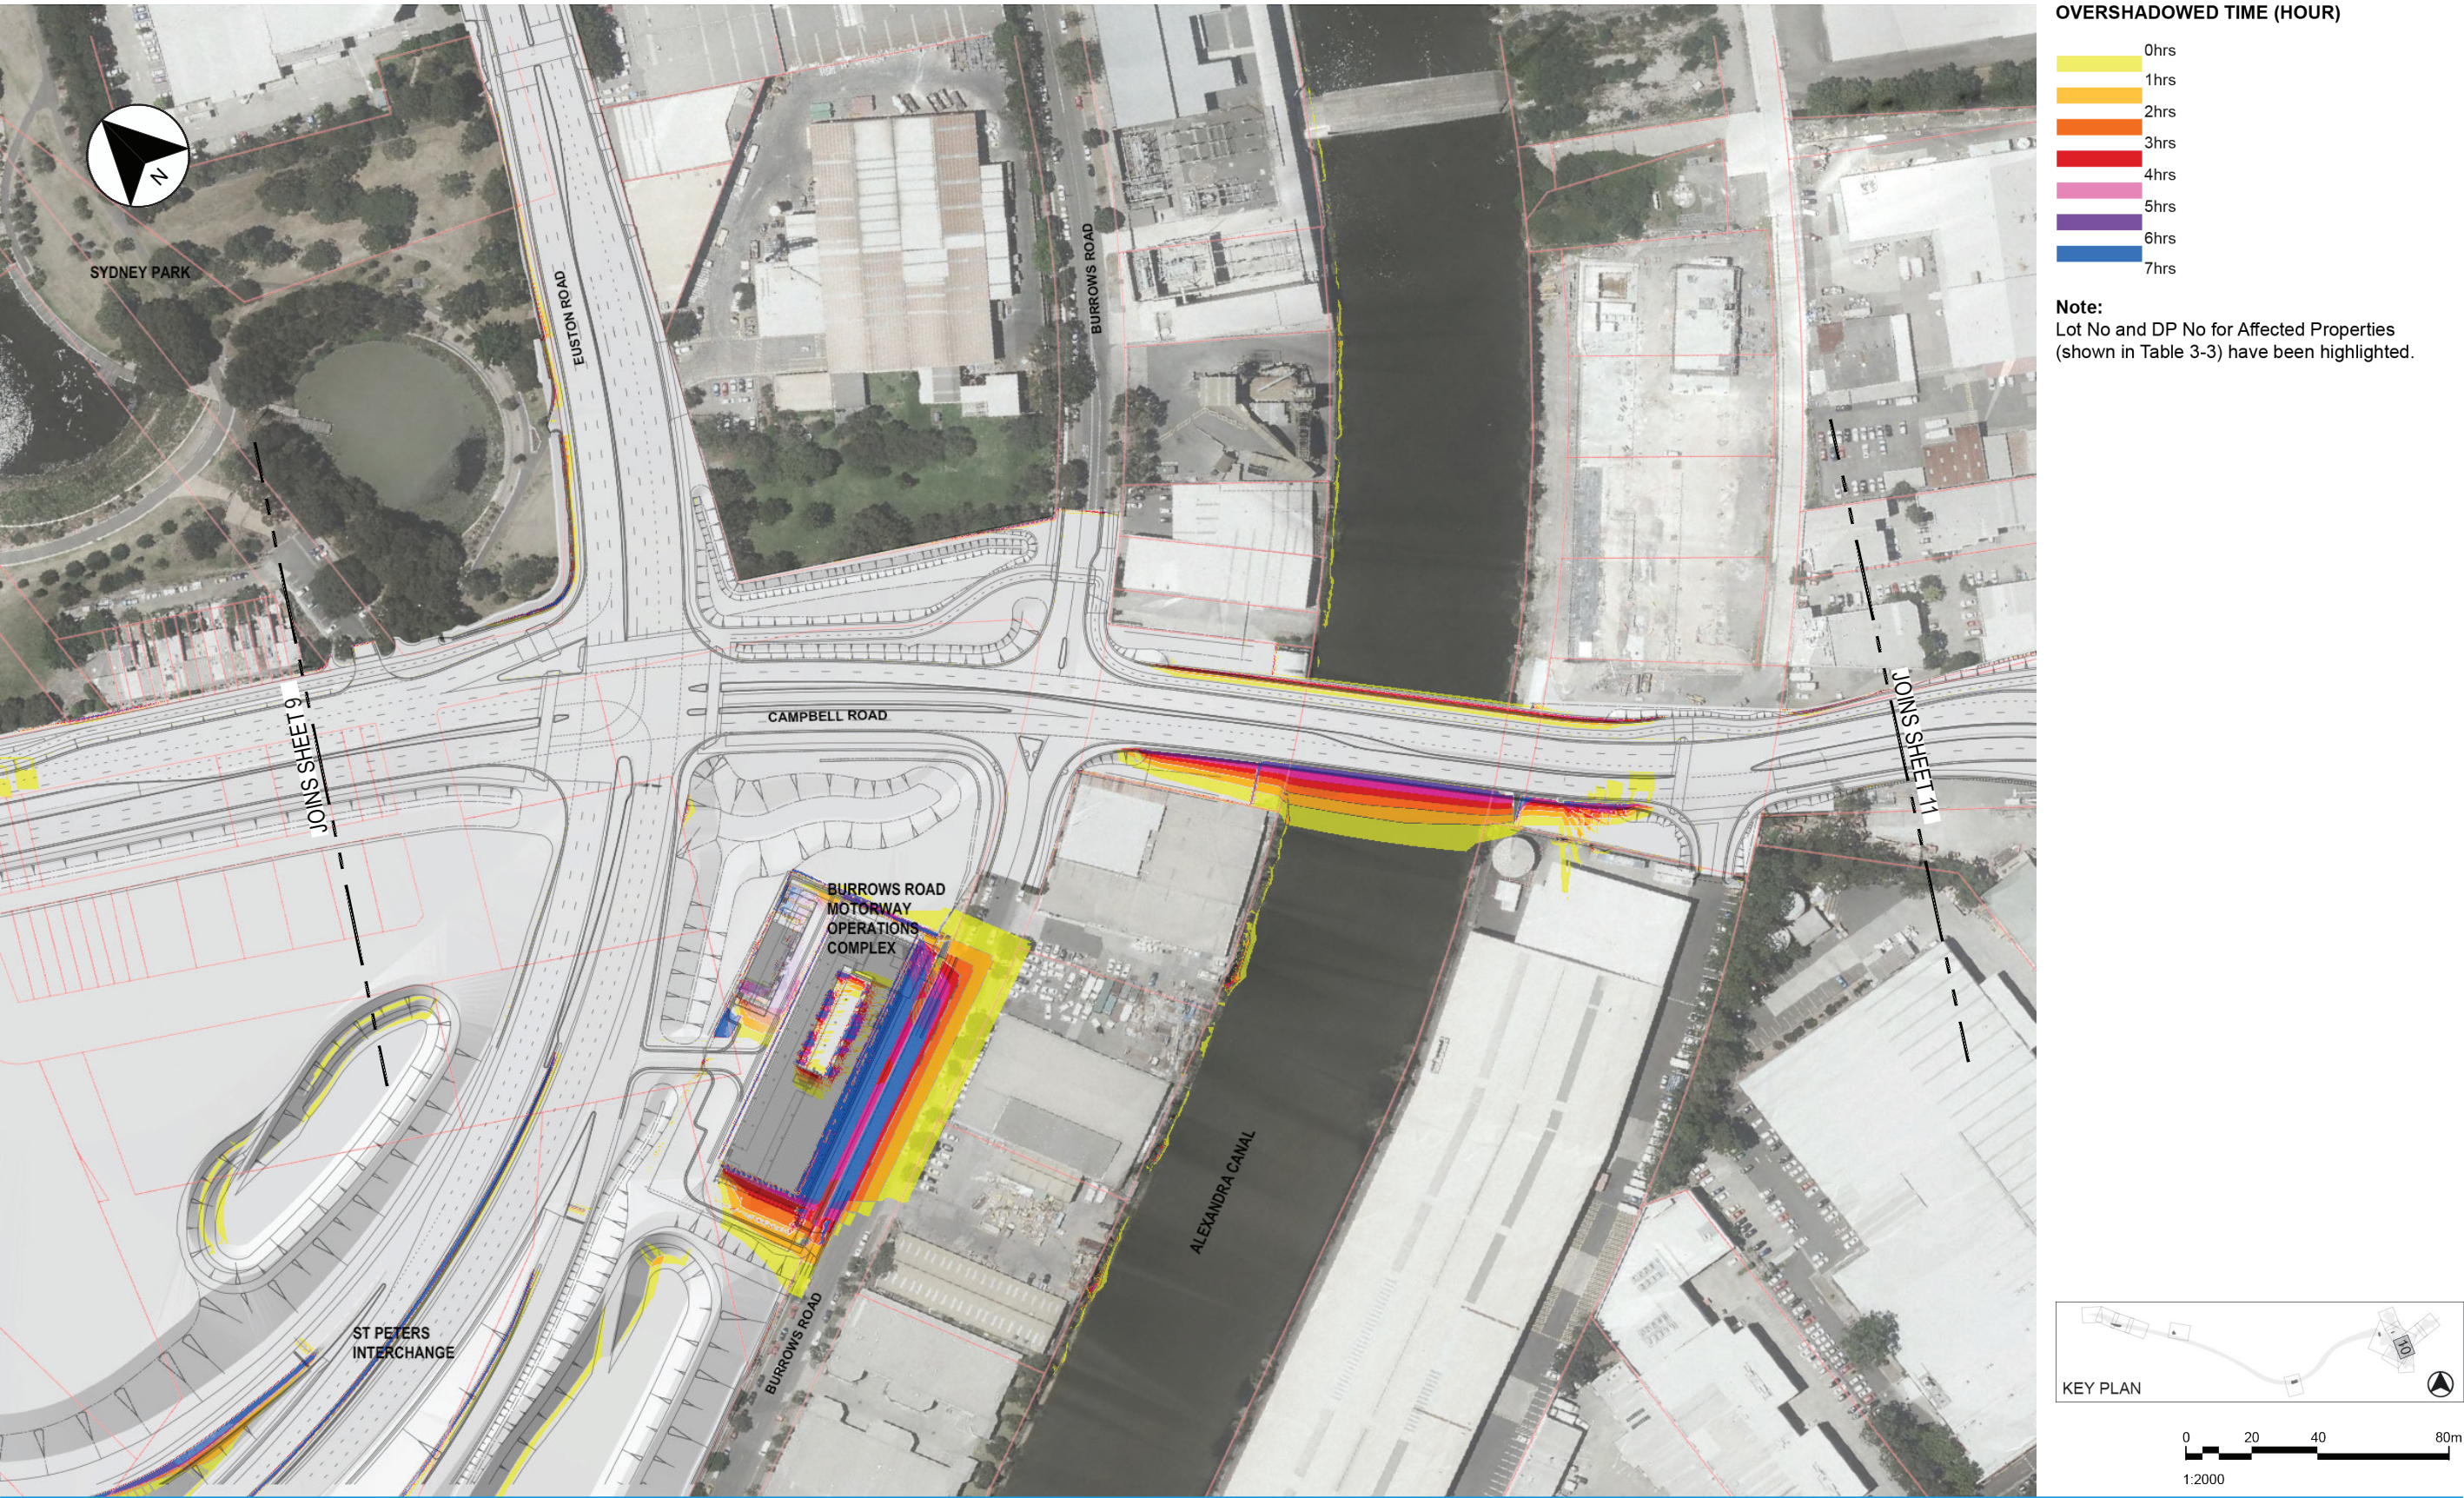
Overshadowing Assessment Plan - Sheet 10 of 14 - 1:2000
